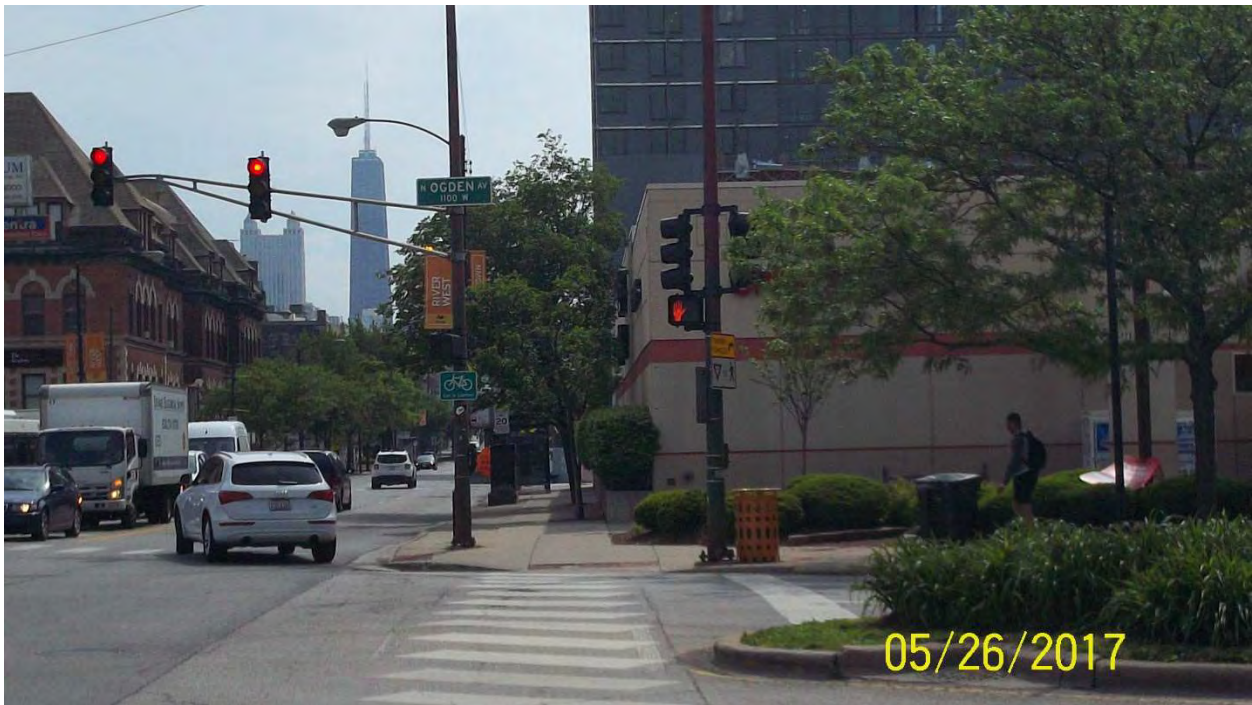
Southwest corner of Chicago Ave. / Ogden Ave. – Looking East
